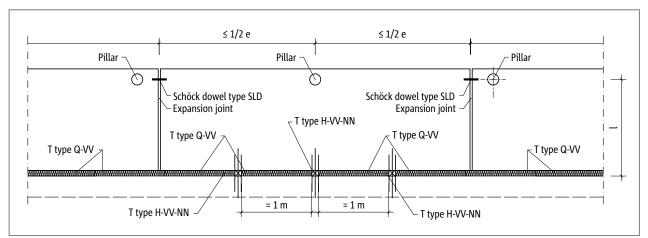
Schöck Isokorb® T type H: Expansion joint layout
